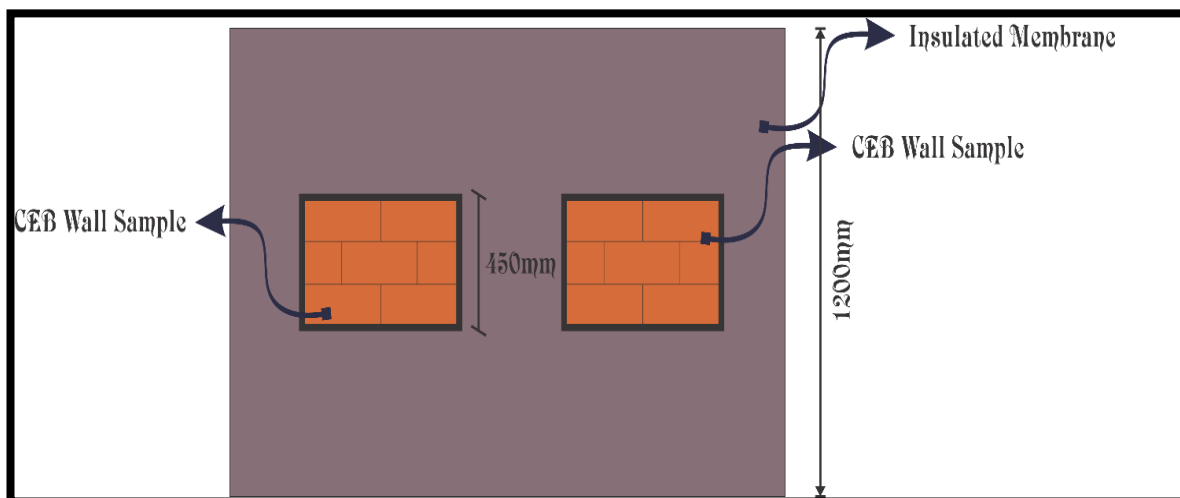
Elevation of in-situ thermal test with CEB blocks exposed to laboratory environment.
